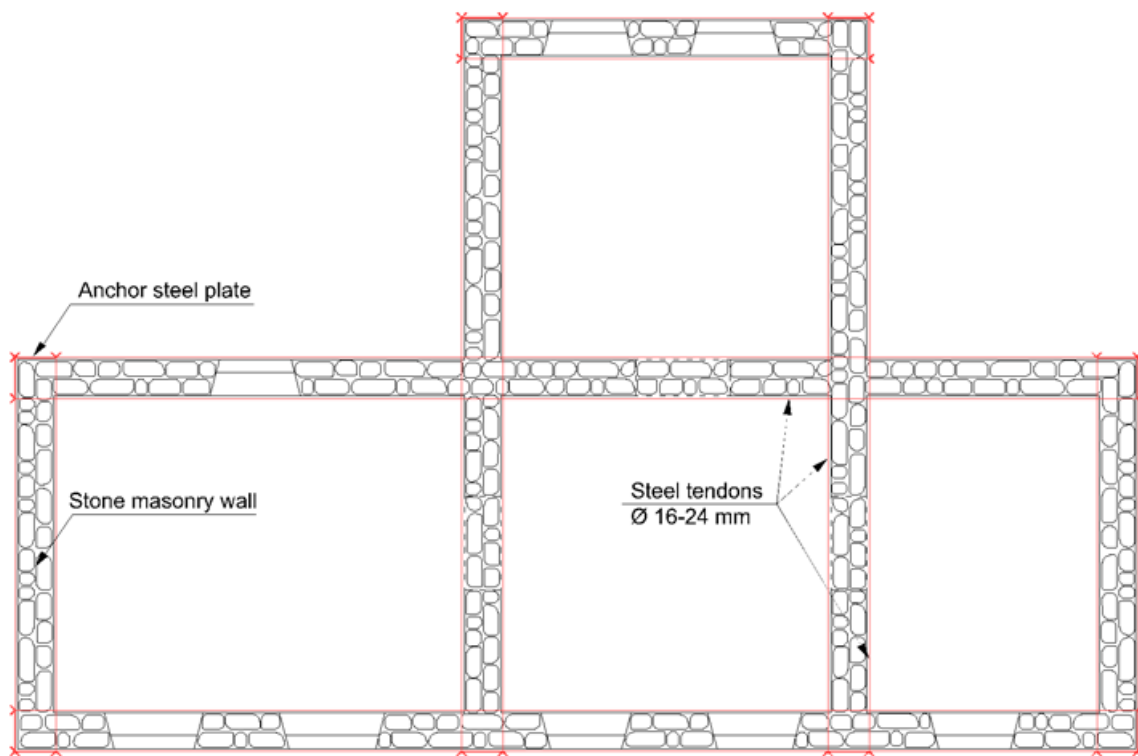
Position and distribution of steel ties in plan of a stone masonry house
